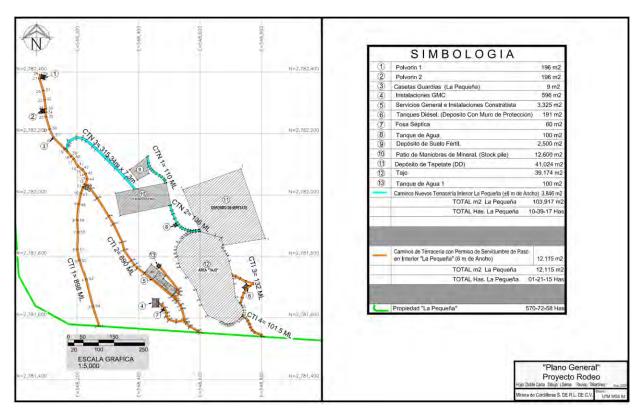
RODEO PROJECT GENERAL LAYOUT
